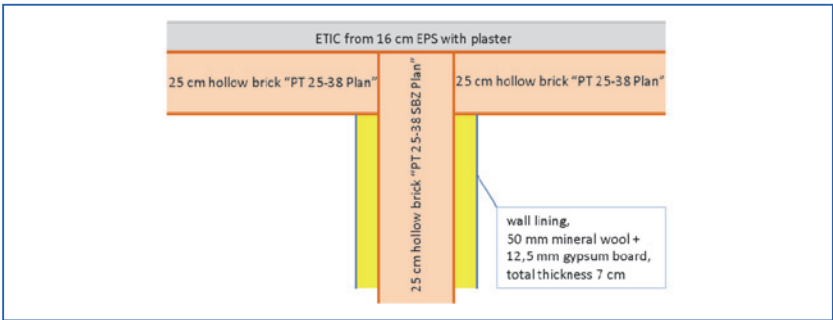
Example of a typical partition and outer walls in brickwork with typical concrete floor with floating screed.
